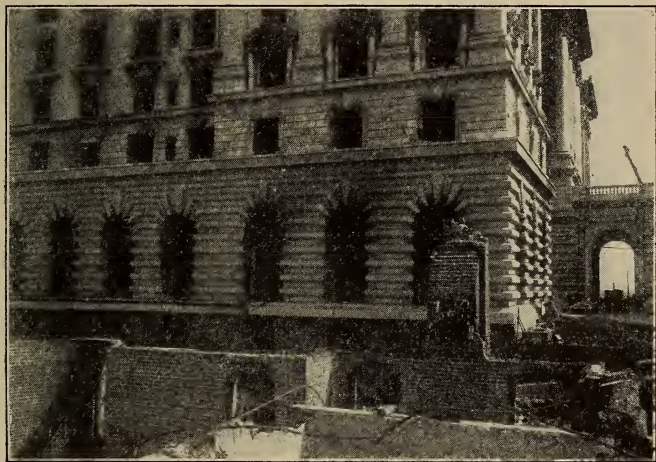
Fairmont Hotel; North Front, Showing Earthquake Cracks in the Terra-Cotta Veneer of the Second Story Walls.
